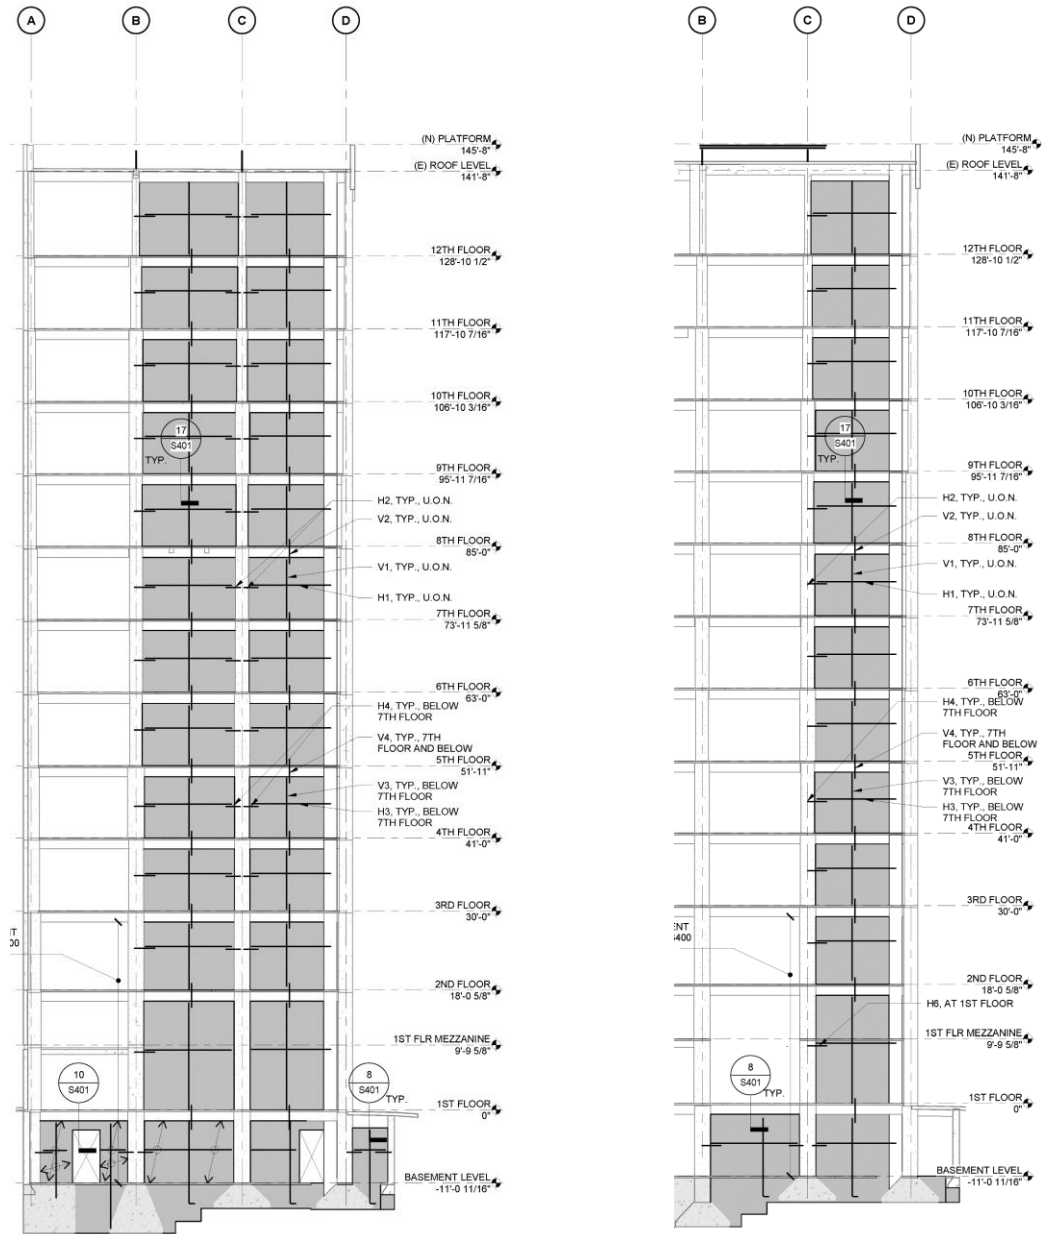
Elevations of transverse structural walls along grid lines 3 (left) and 5 (right).
